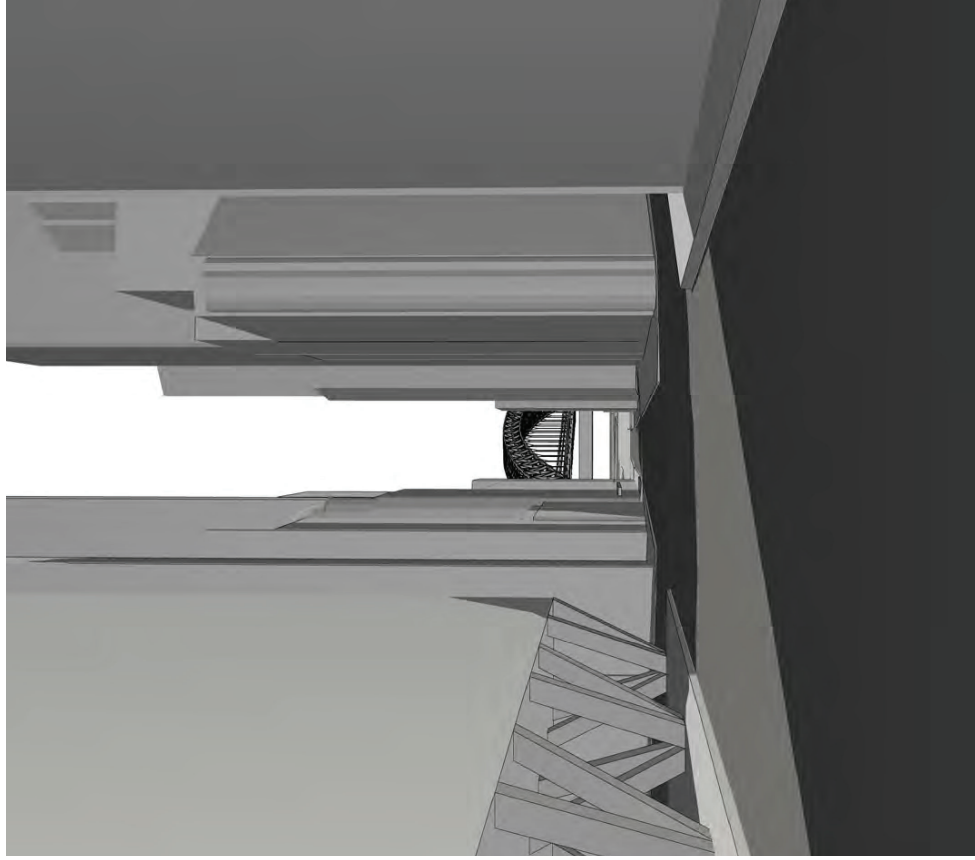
View from Model - Current with 33-35 Pitt Street DA Stage 2.
